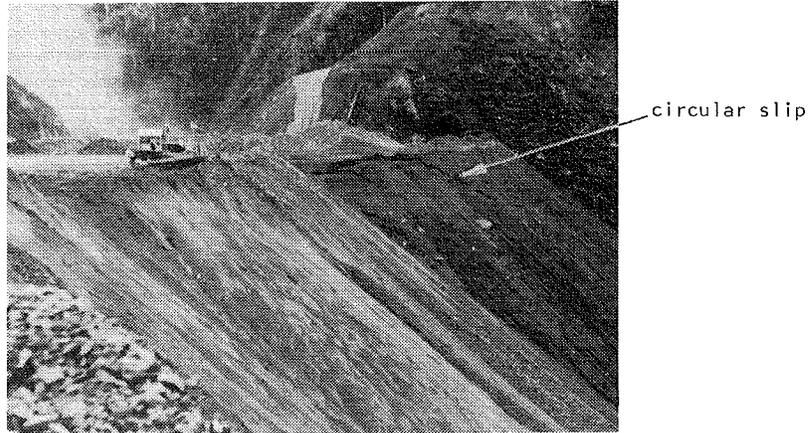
Shallow surface failure in large waste dumps are generally of a circular type.
